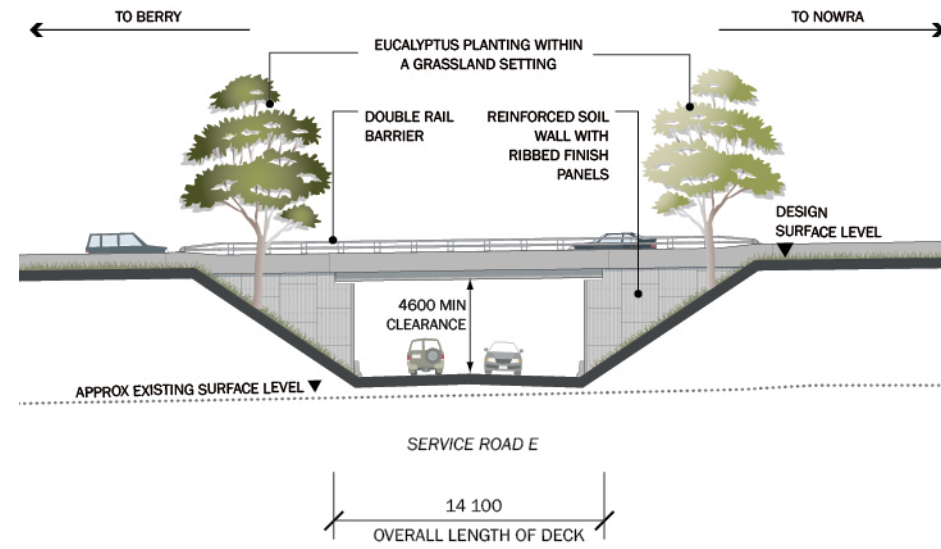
Elevation – Bridge SB09: Service Road E Underpass (Scale: 1:400@A3)
